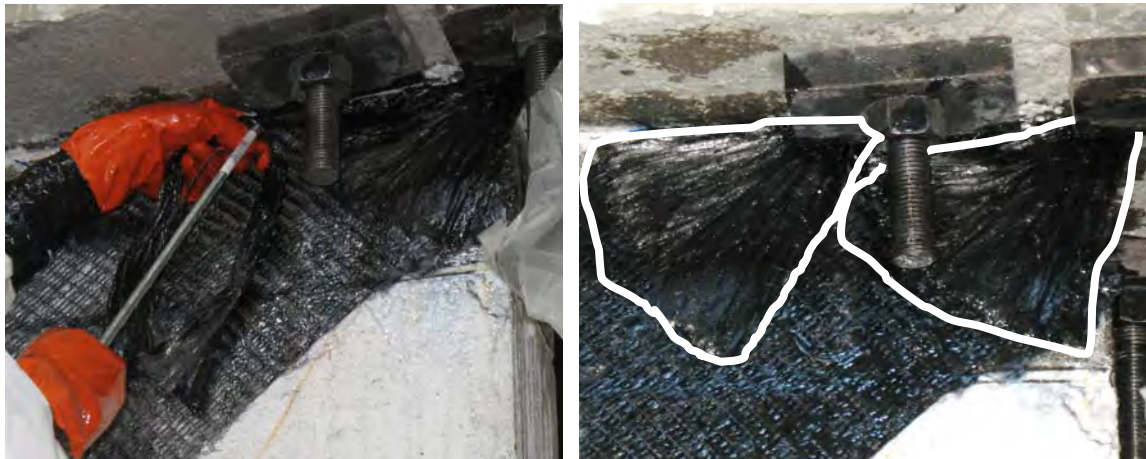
Application of the CFRP anchor into the top concrete beam (left). CFRP anchors installed (right)
